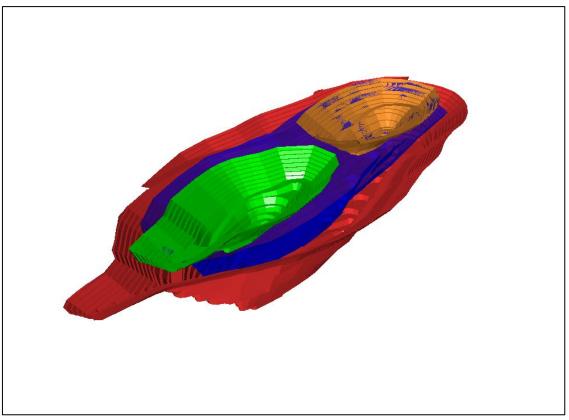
Final Pit Design - 3D View of Pit Stages
